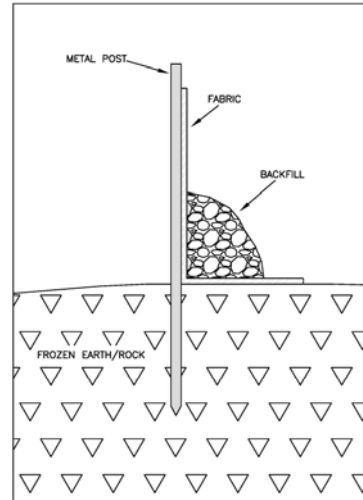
Properly Constructed Silt Fence for Frozen Earth or Rock
